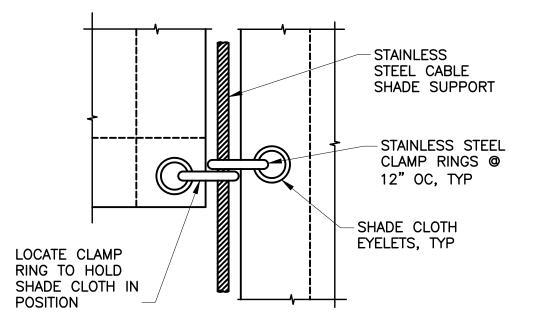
DETAIL SHADE CLOTH AT CABLE ANCHORAGE NETTING CABLE SIDE NO SCALE
